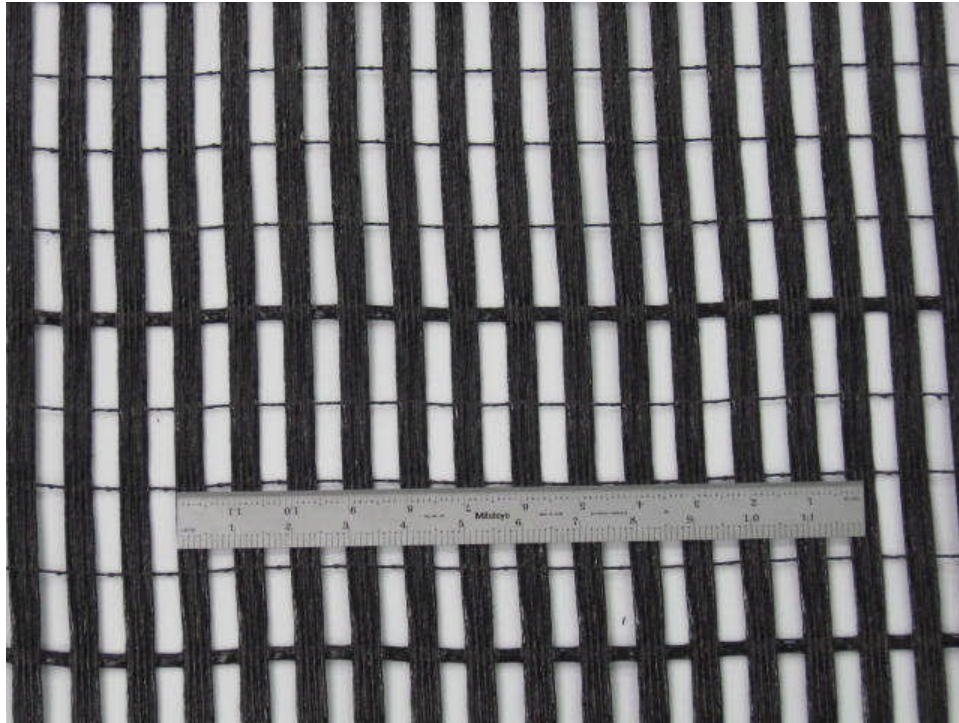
Photo of Miragrid 24XT (machine direction is perpendicular to ruler shown).
